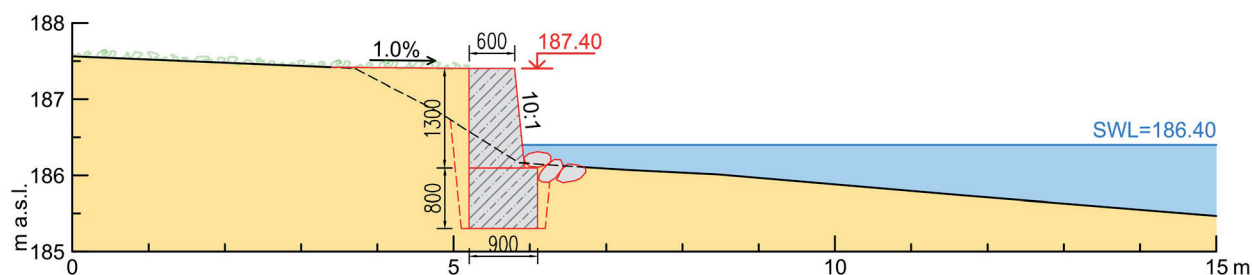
Cross-section of a retaining wall used as a representative alternative for a technical bank stabilization measure.
